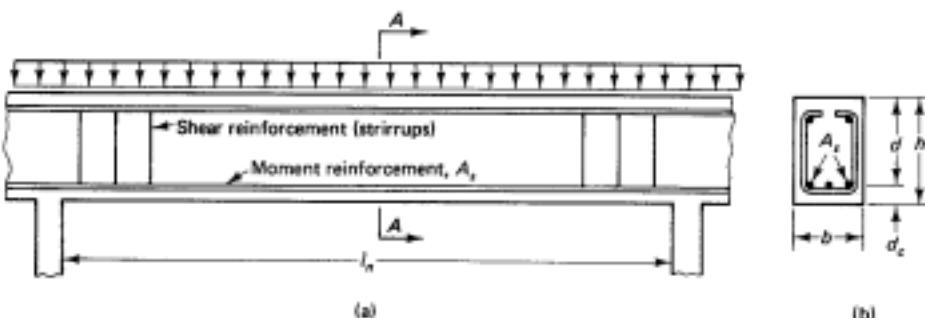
Typical reinforced concrete beam: (a) elevation; (b) section A–A.
